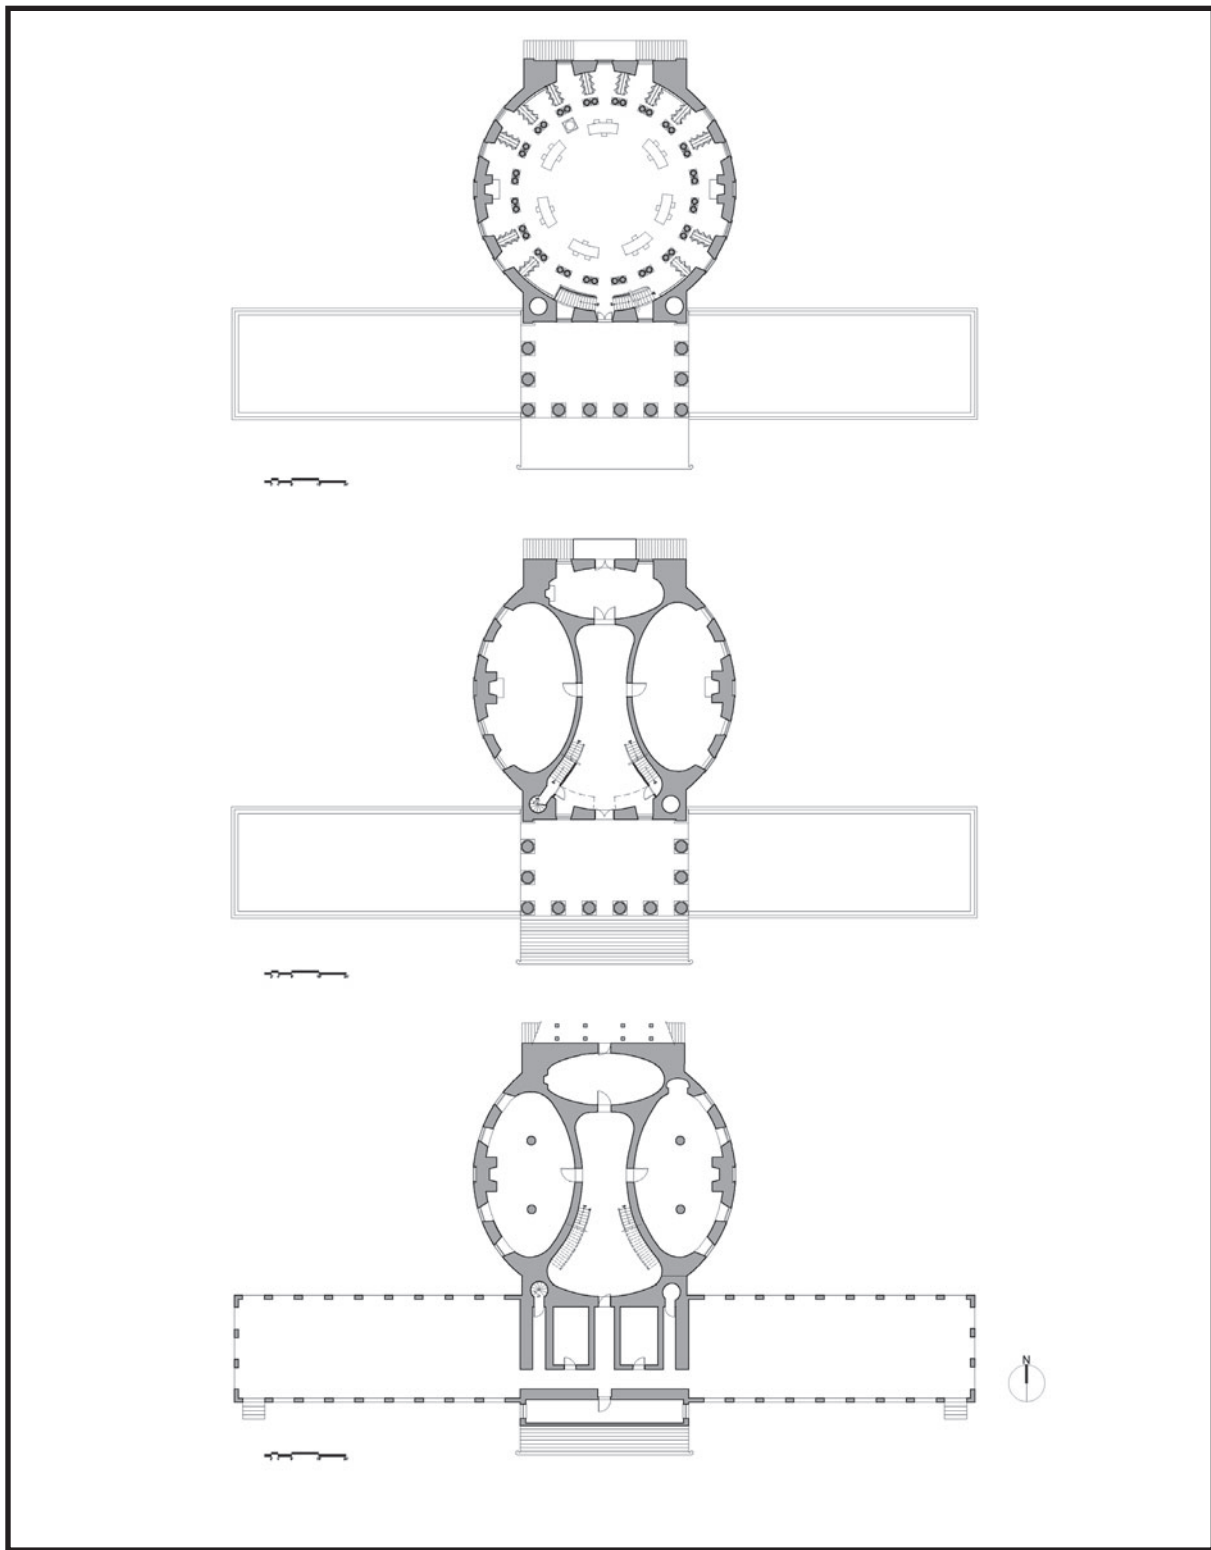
Conjectural floor plans of the original Rotunda and terraces in 1827: Dome Room (top), main floor (center), and ground floor (bottom). Drawings by John G. Waite Associates, Architects, 2022.
